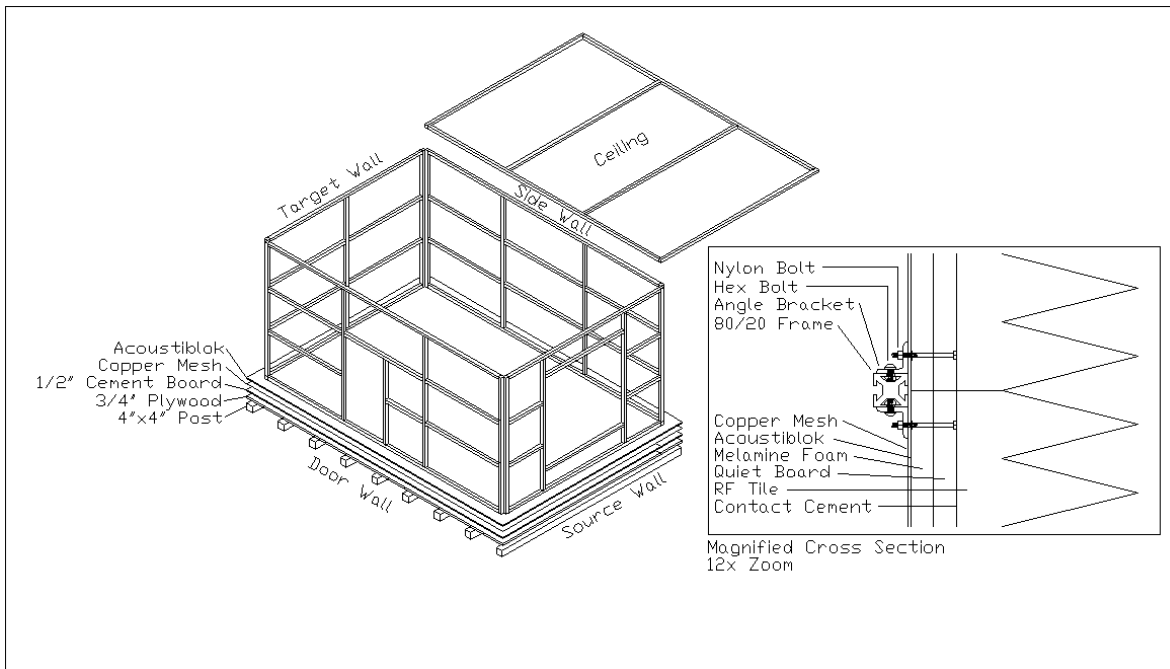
Exploded view of chamber frame and floor. Magnified cross section shows wall construction detail. The Acoustiblok and copper mesh are held in place with a 0.25 x 1.5 in. nylon flat head bolts and nuts attaching these layers to each angle bracket. The Melamine/Quiet Board panels are held in place with 0.25 x 4 in. nylon carriage bolts. Finally, RF tiles are glued to the Quiet Board using contact cement.
